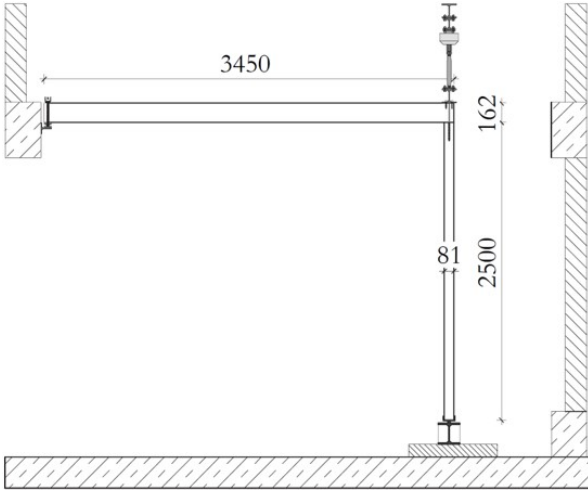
Section of a L-junction configuration indicating the dimensions of the elements. The width of the wall and floor elements not shown in this section is three metres.
